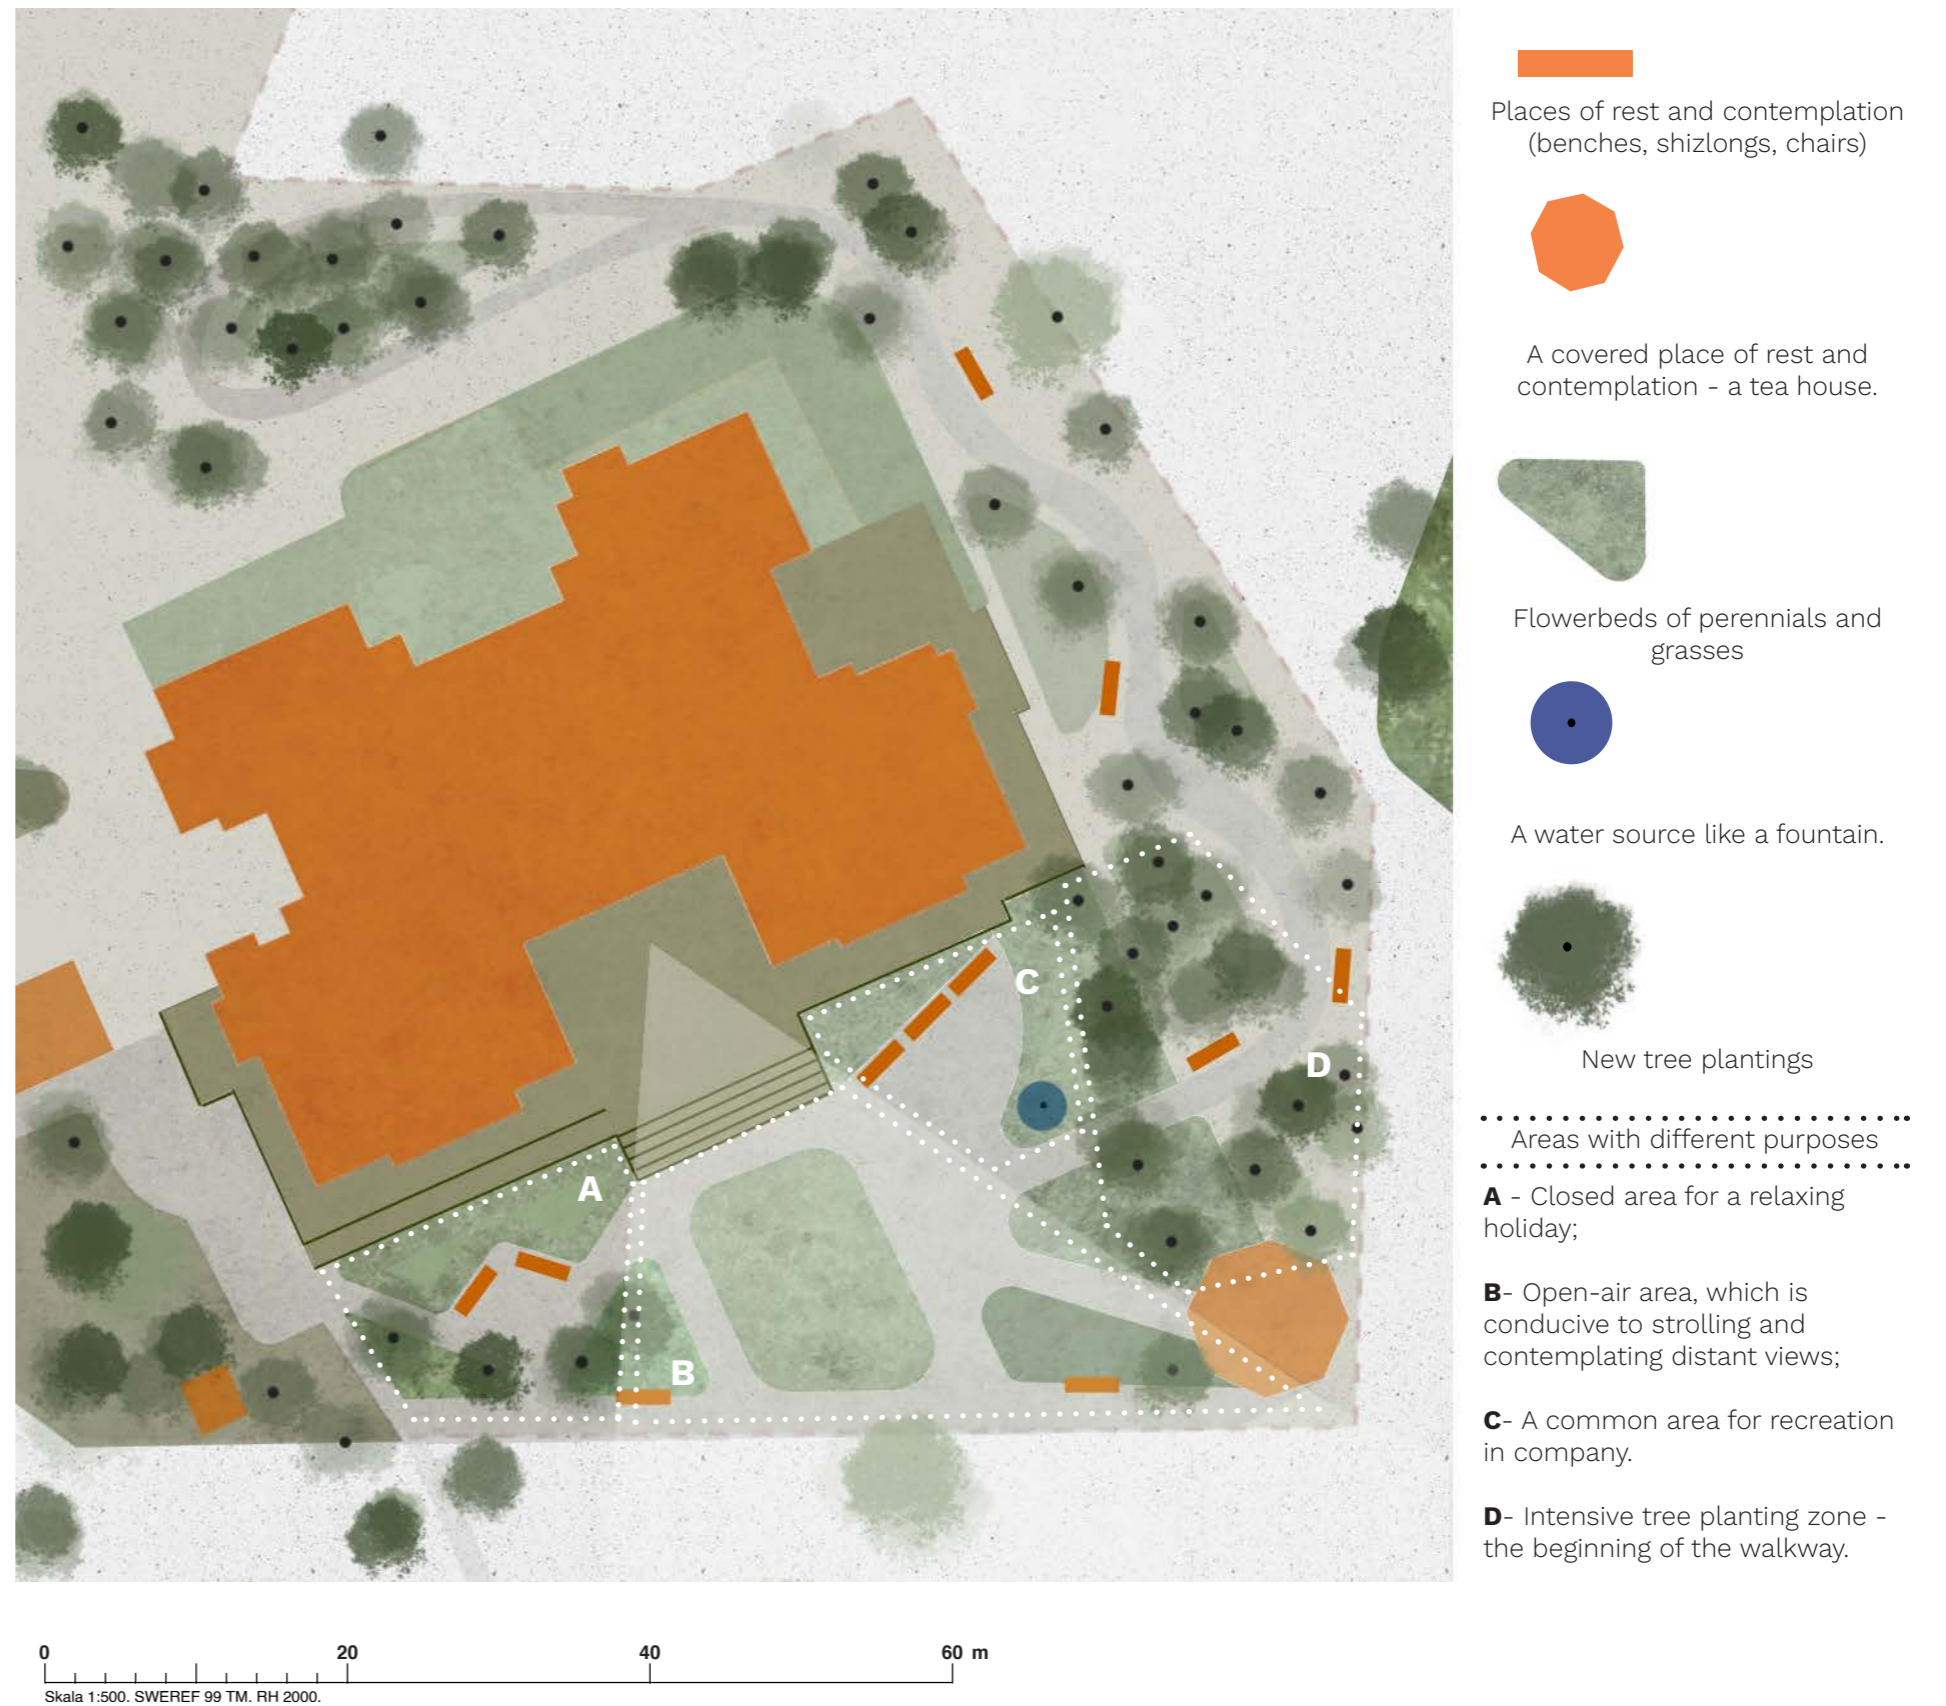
The illustrative plan shows how the new footpaths will be laid out, what blocks the space will be divided into and where benches, the tea house and new trees will be planted.
